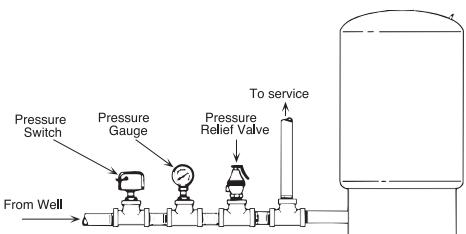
Typical installation with vertical pre-charge tank and submersible well pumps
